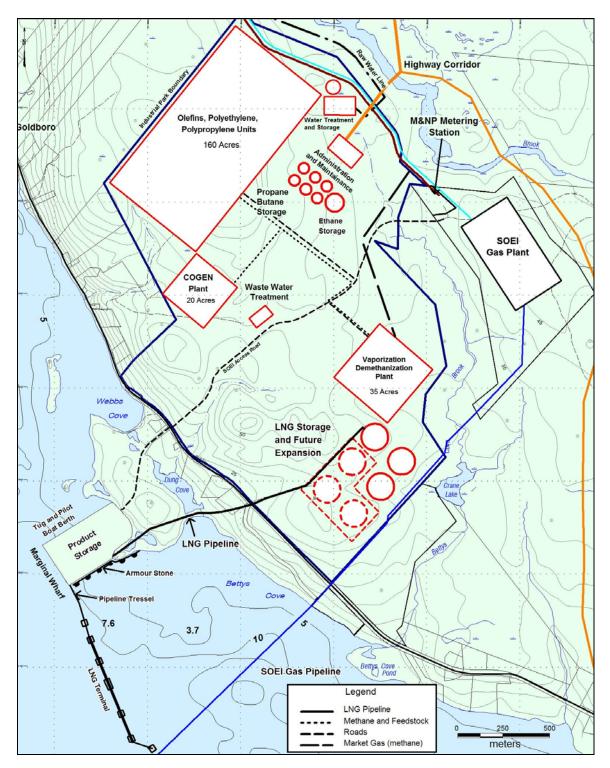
Development Area showing proposed locations of buildings, storage facilities, LNG pipelines, and access roads.
